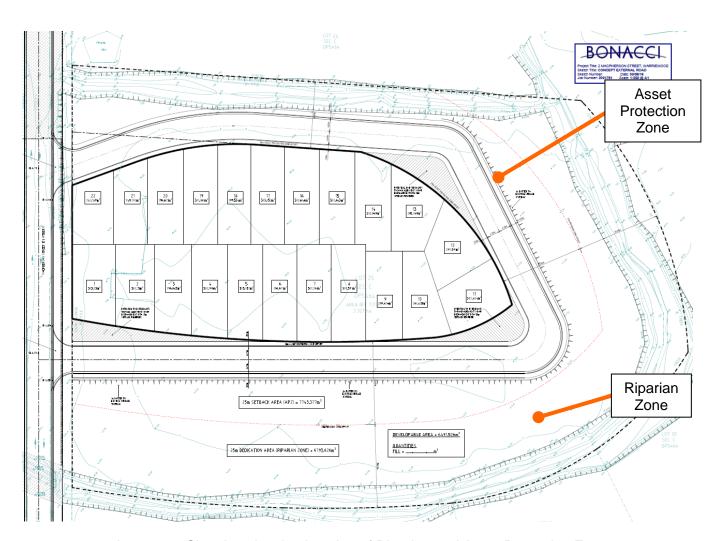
Site plan showing location of Riparian and Asset Protection Zones.
